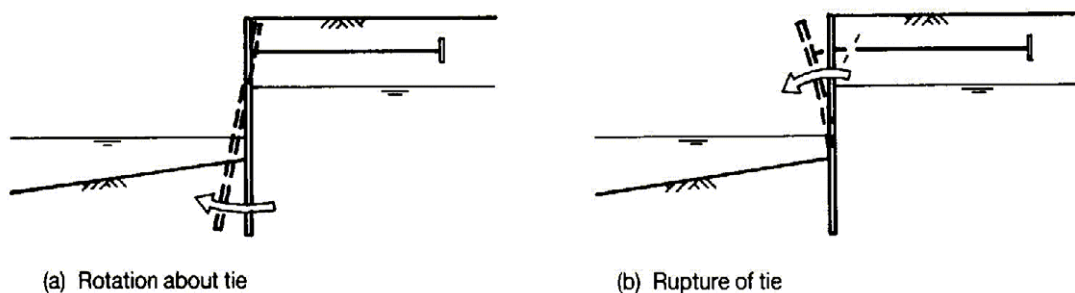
Indicative failure modes of anchored sheet piles
